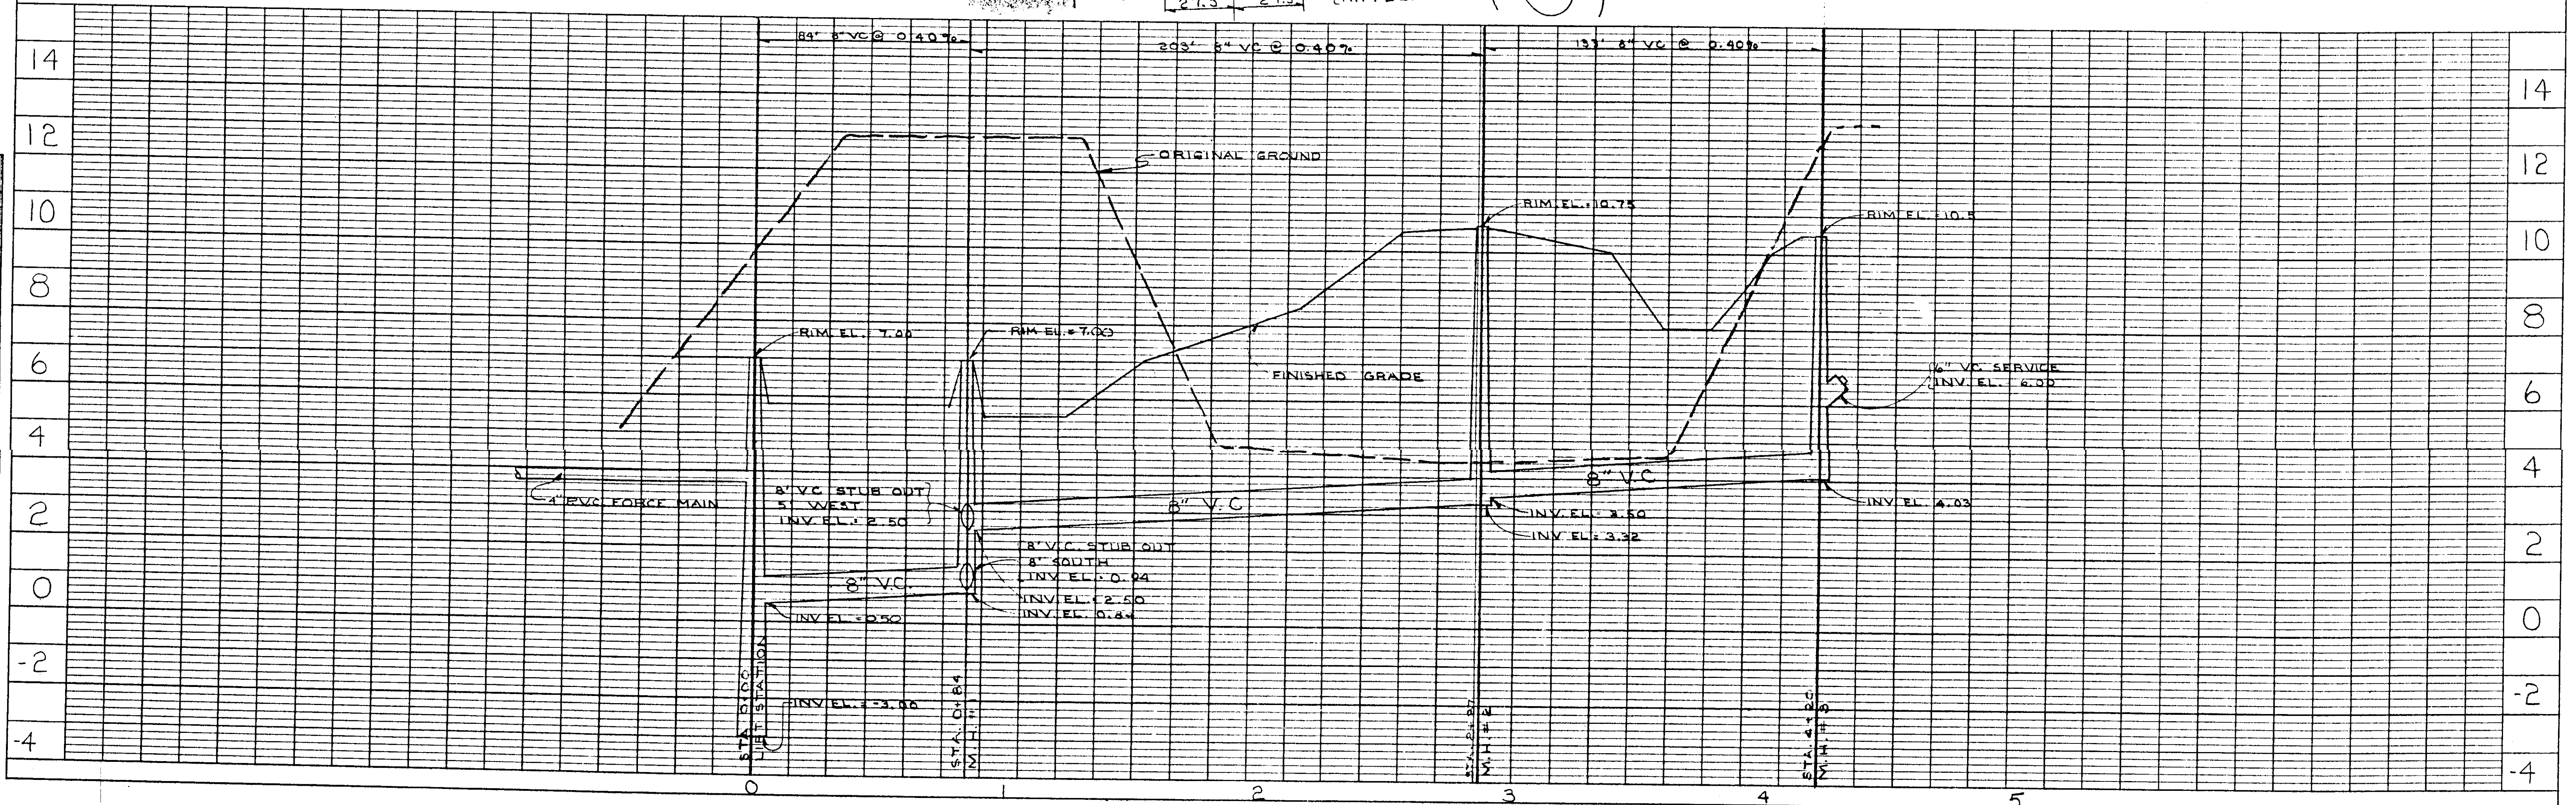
SINGLE PLAN-PROFILE O.P.R. & S.E. STANDARD
